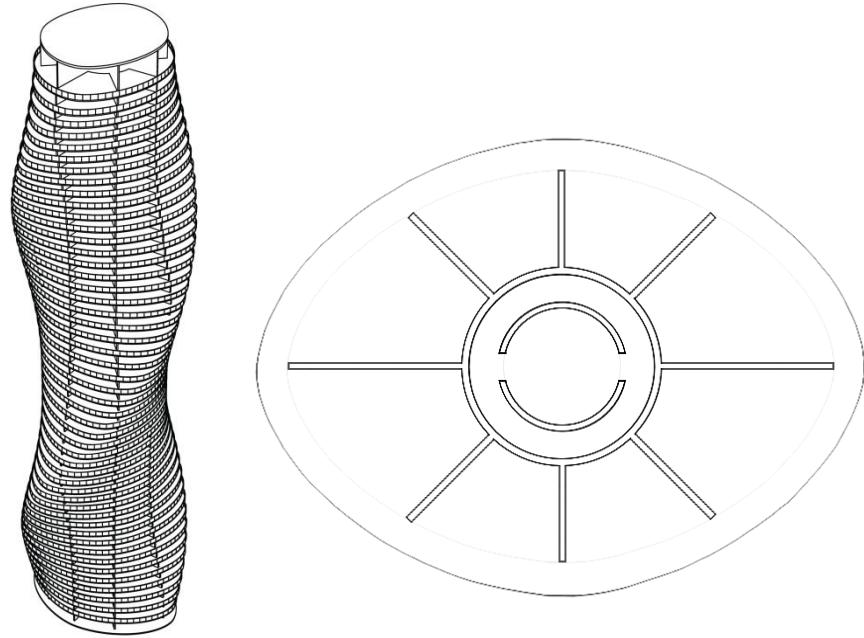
Model and plan of the tower with a radial grid as well as a consistent 6° of rotation per floor.
